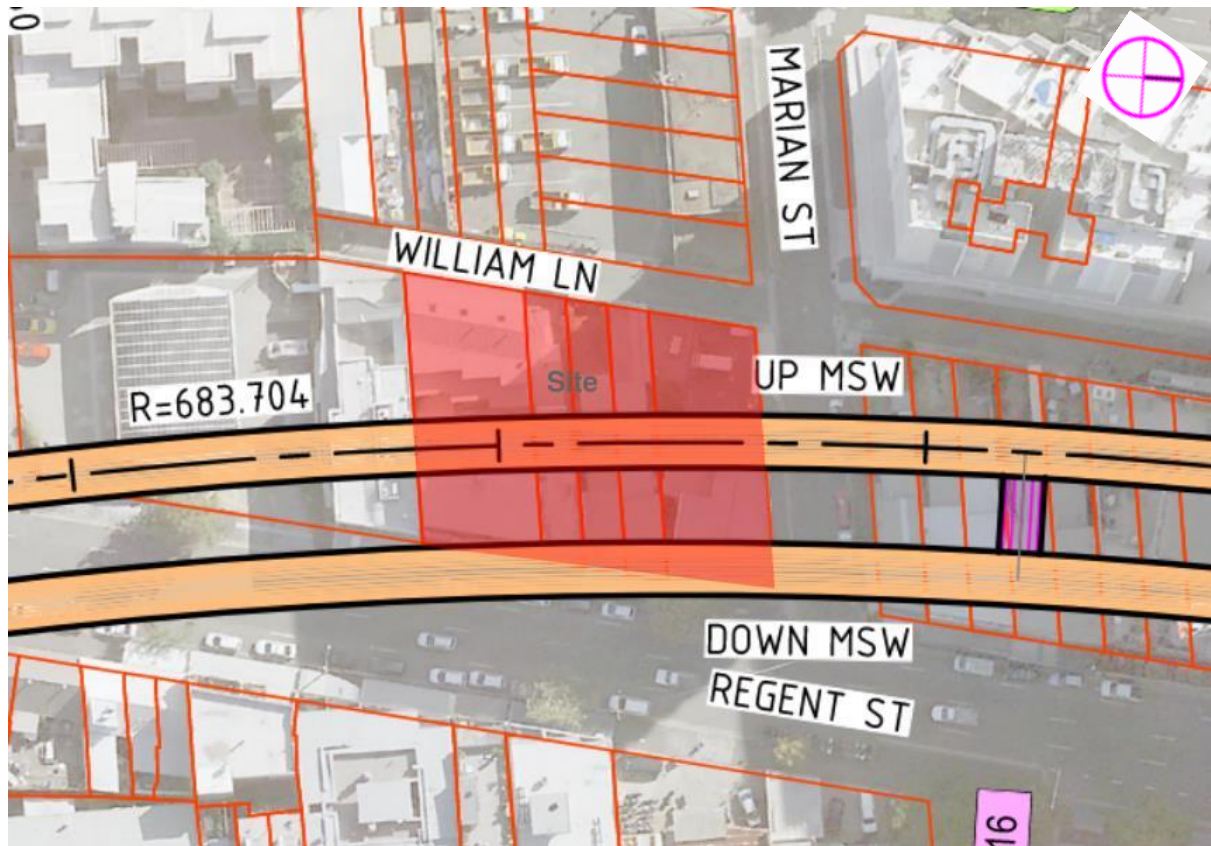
Location of Sydney Metro Tunnel relative to the Site, shown in orange.
